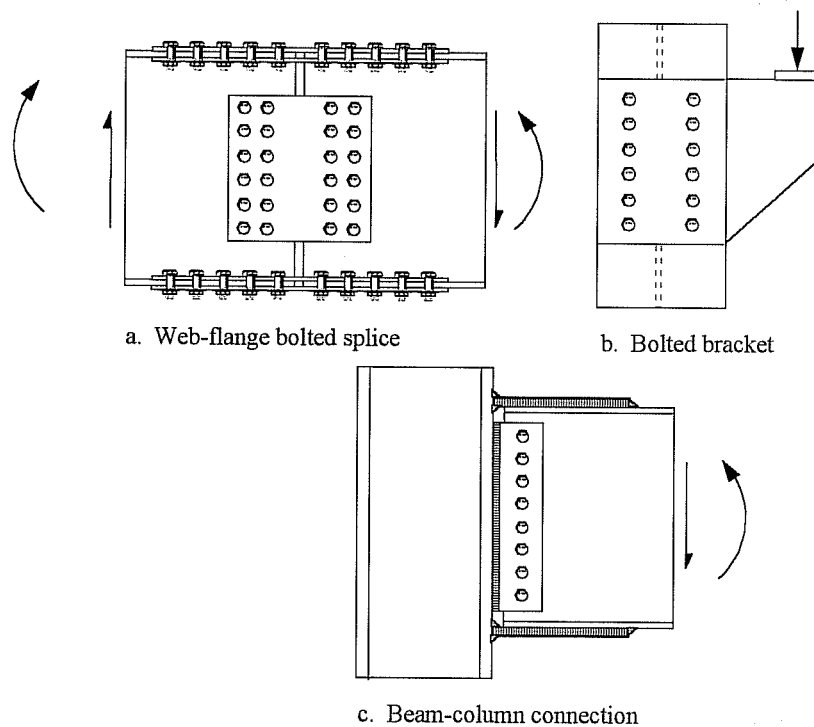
Typical examples of eccentrically loaded group of bolts
